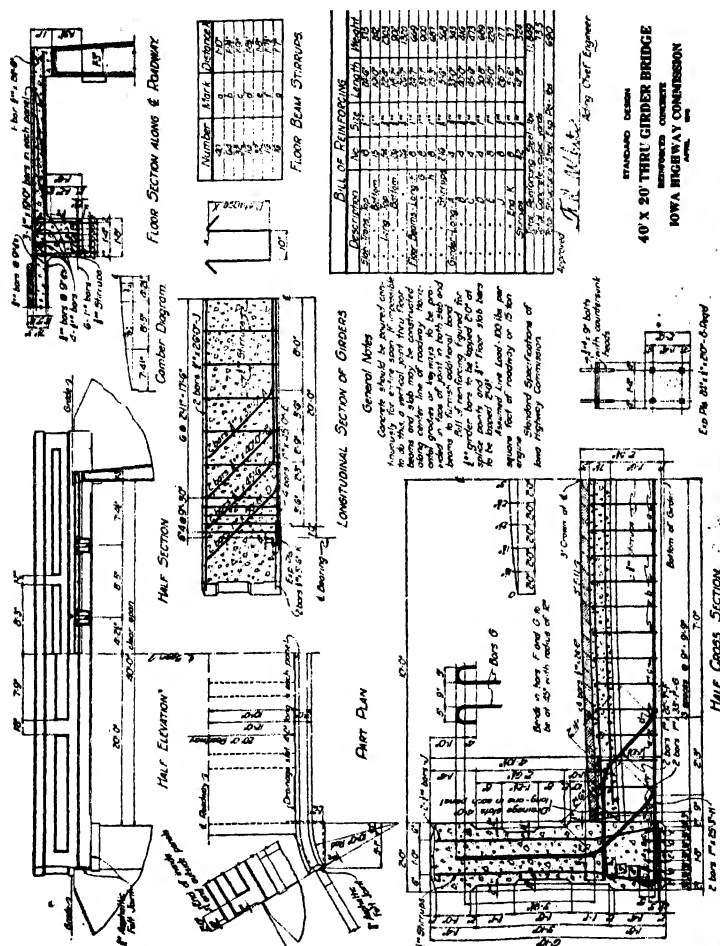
Through girder reinforced concrete bridge of the Iowa Highway Commission.
